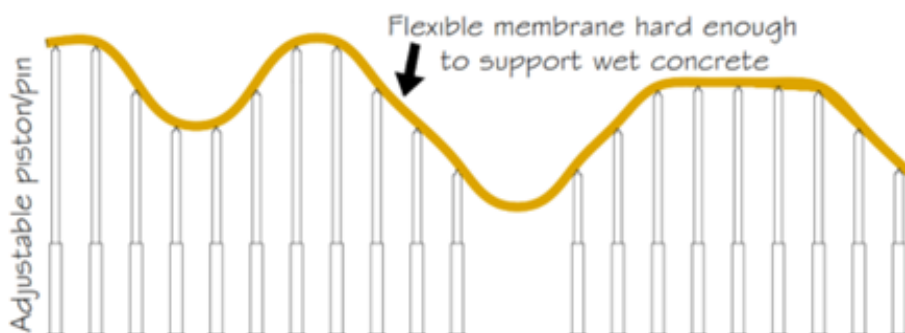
Rigidity of formwork membrane and spaces of vertical supports
